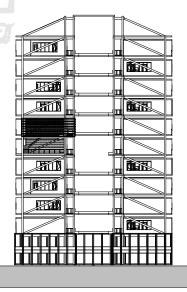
Apartment north elevation Source: Author (2021)
